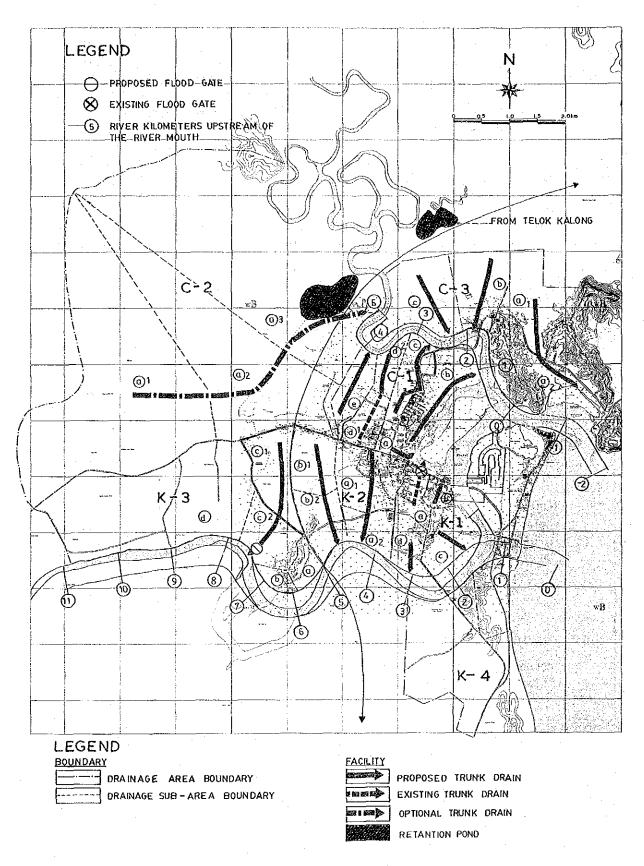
DRAINAGE SYSTEM (ALTERNATIVE - 3)
